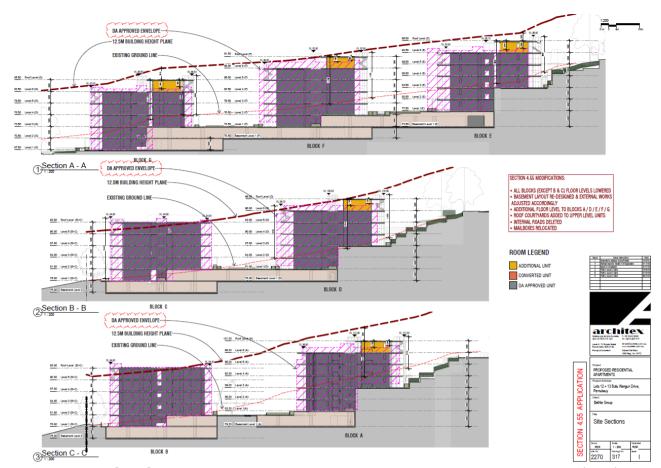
Site Section Plan showing building envelope approved by DA2016/381/1 hatched in purple and portions of modified proposal exceeding the 12.5m height standard (Drawing No. S17, Issue I, prepared by Architex, dated 14/05/2021)
